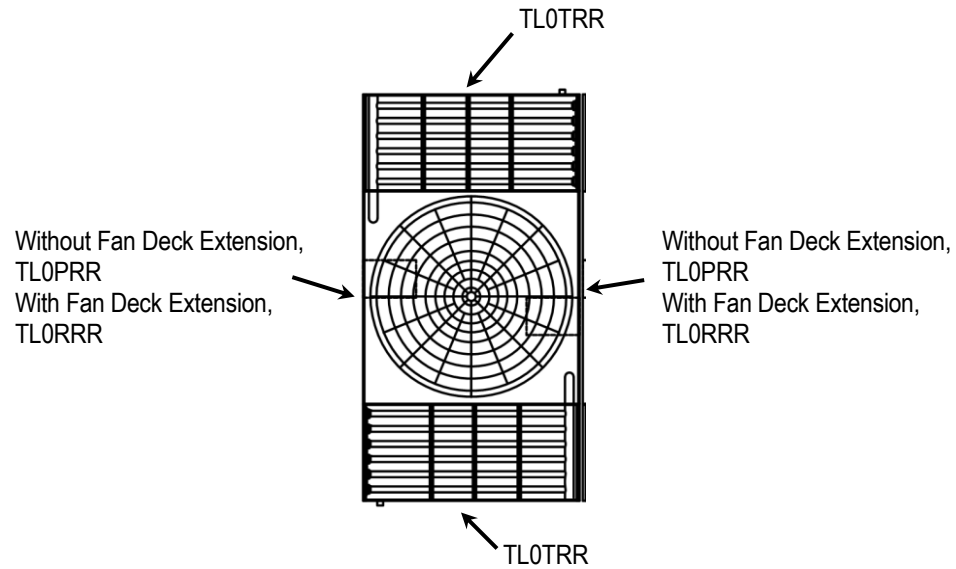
Fan Deck Ladder Installation Reference Drawing Arrangement
